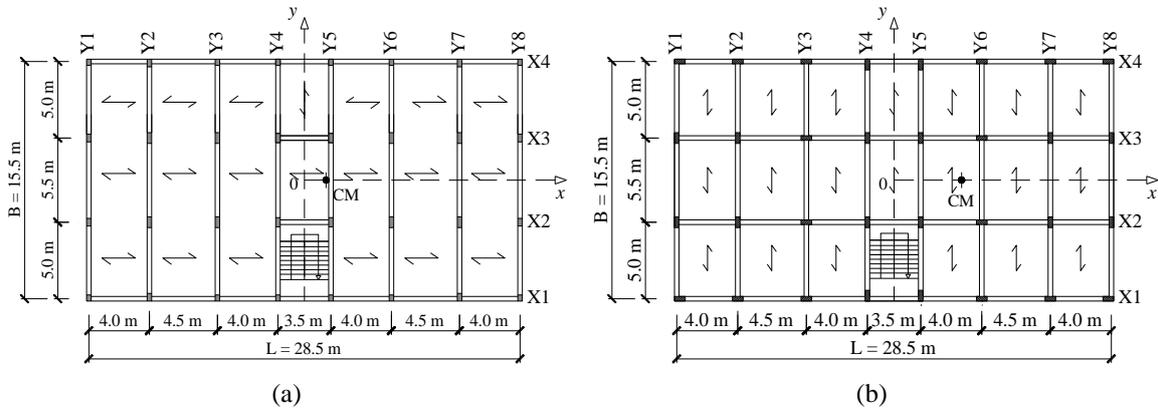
Plan of the building: (a) type GL; (b) type SR
